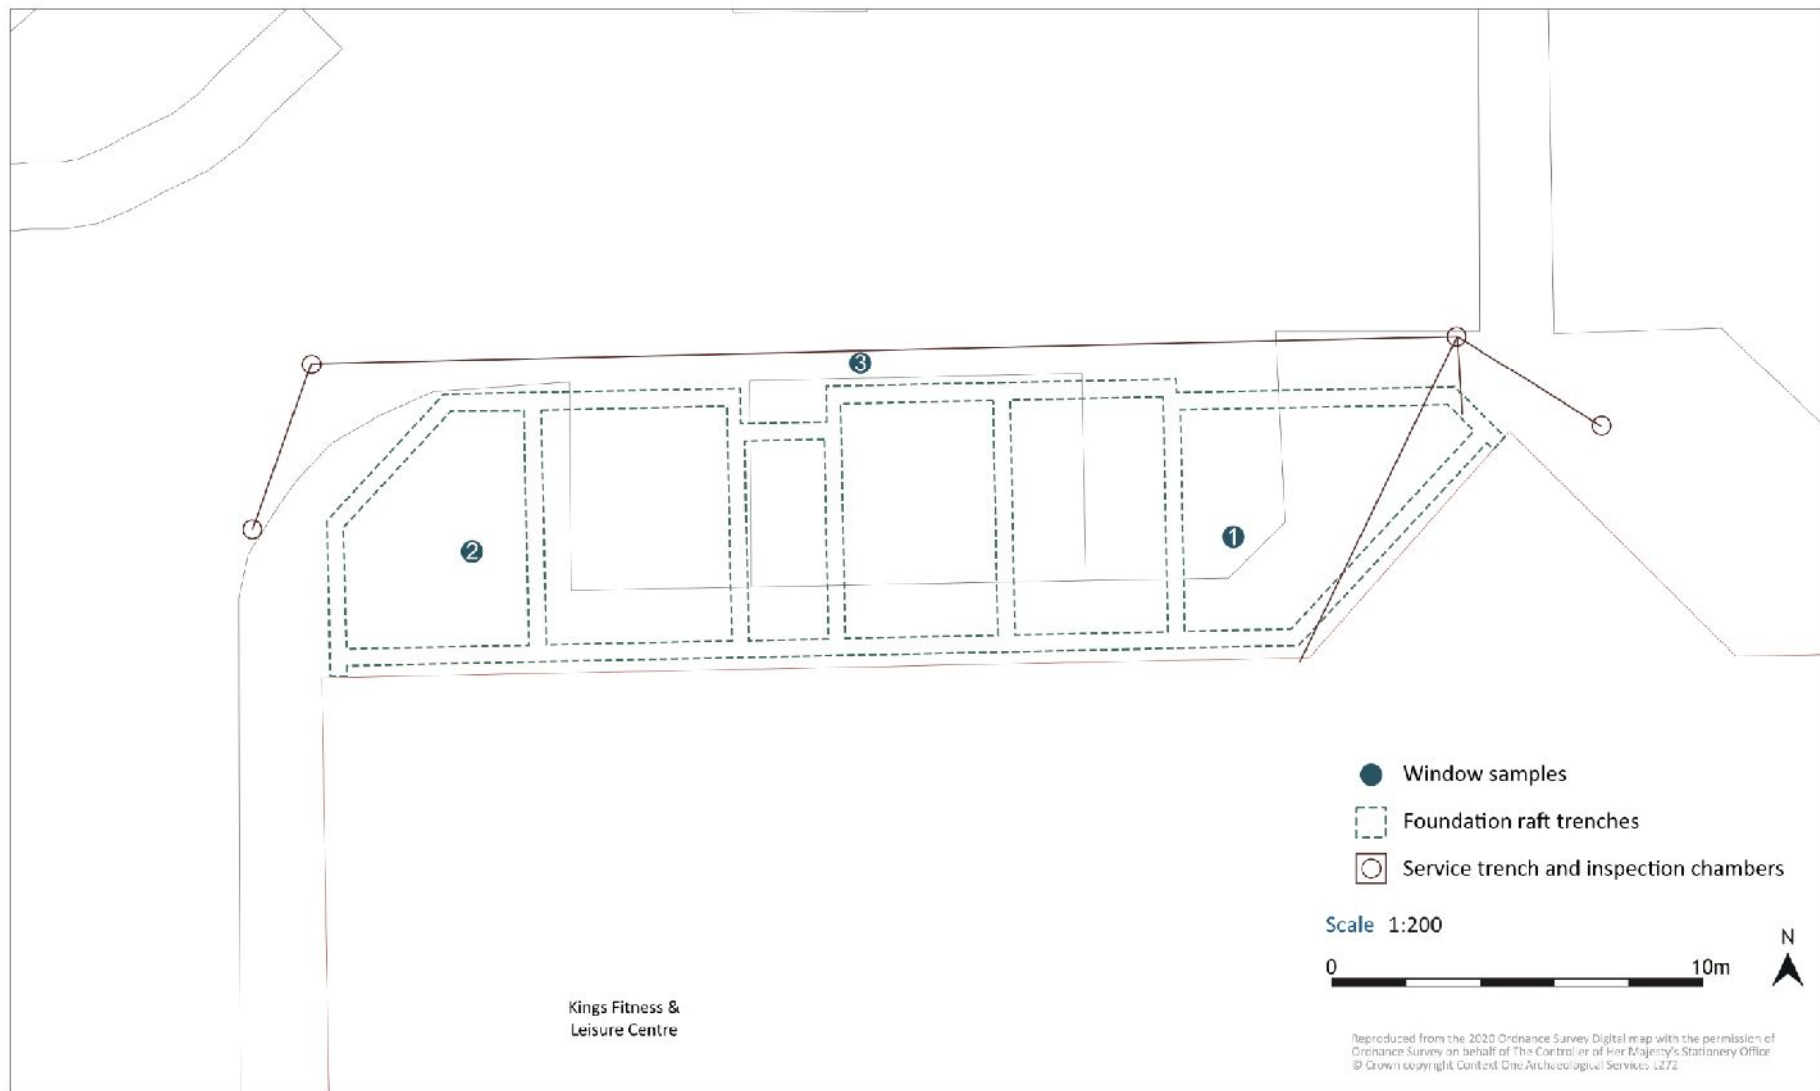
Detailed site setting showing window sample locations, foundation raft trenches & service trench
